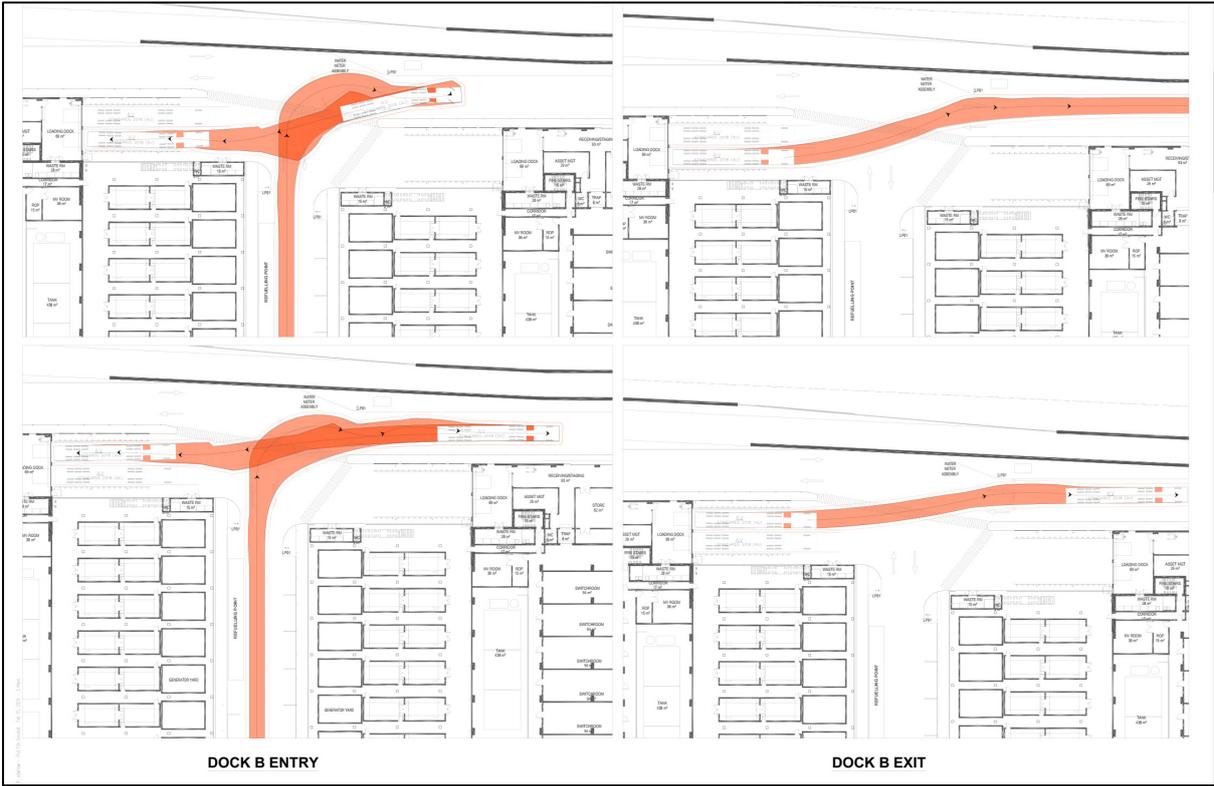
Building B - Swept path analysis showing loading dock entry and exit for waste collection vehicles
